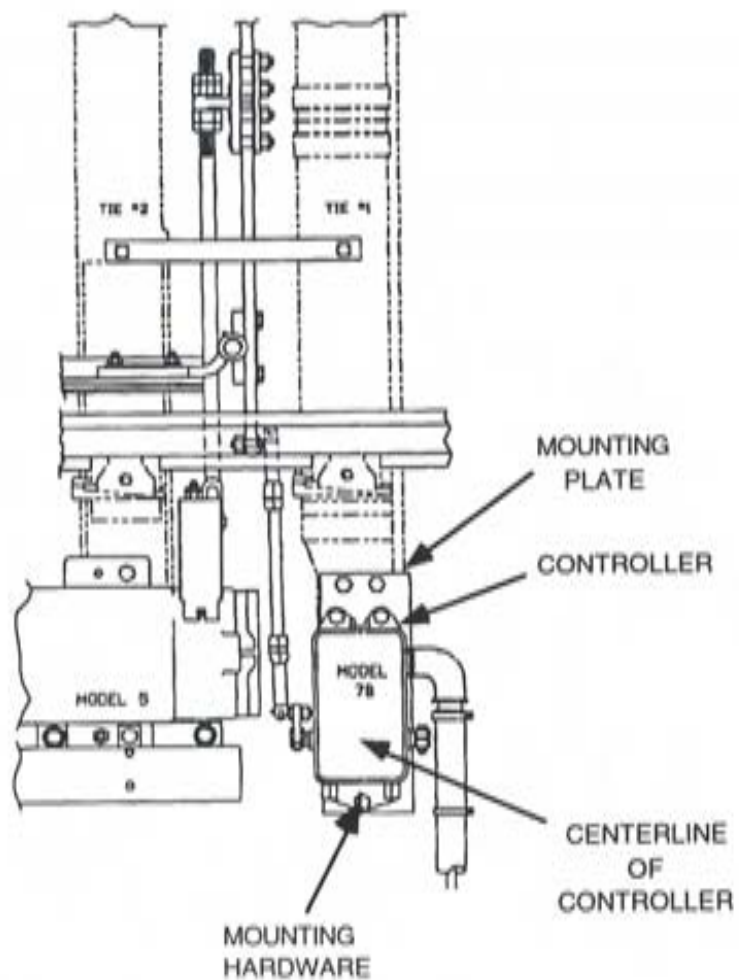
Layout of Model 5 Switch Machine and Model 7B Circuit Controller
